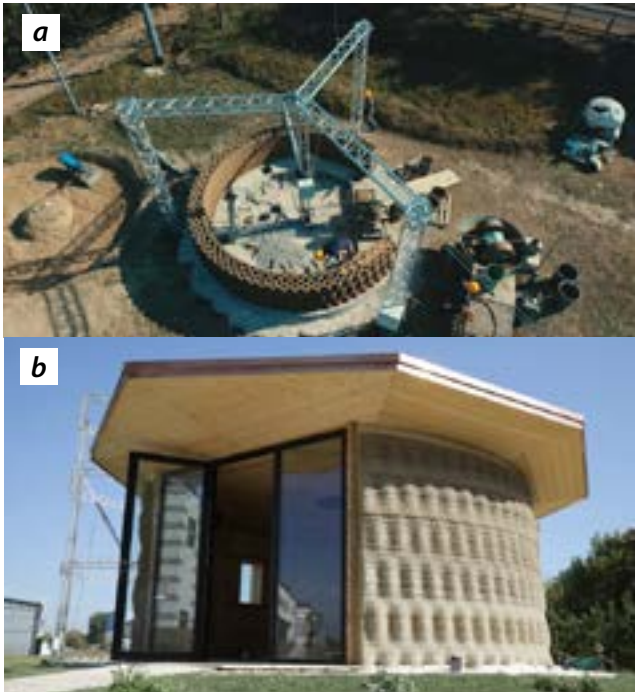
(a) Gaia House being built; (b) Gaia House finished.
